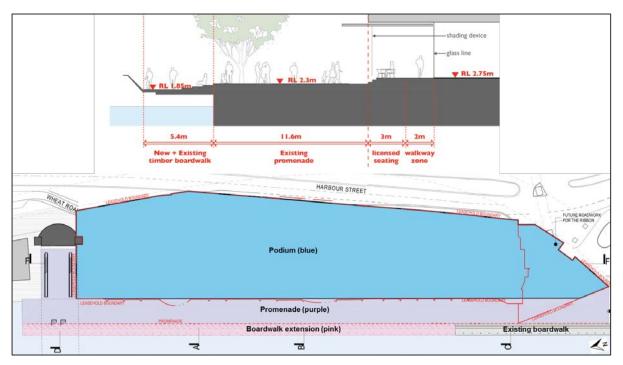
| Proposed boardwalk extension (highlighted pink) (Base source: Applicant's RtS)
